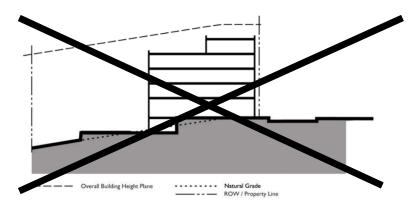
C. Flat roof building height measurements (not drawn to scale).
